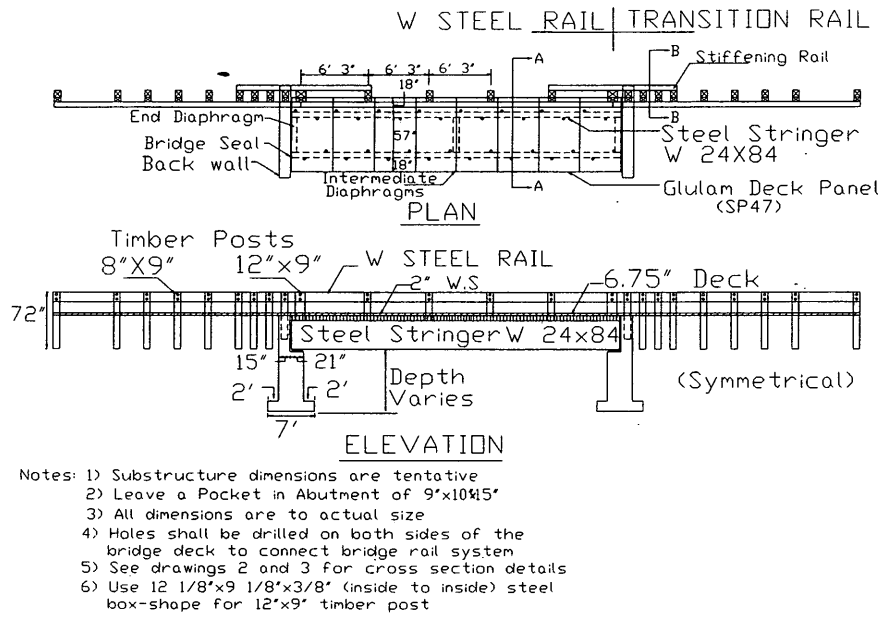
Timber Bridge Rail System 3 for PL-1: plan and elevation.
